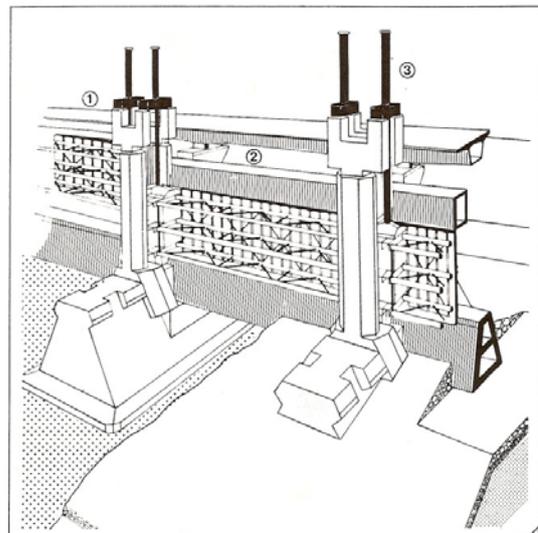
Storm-surge Barrier Eastern Scheldt (view of structural components)
